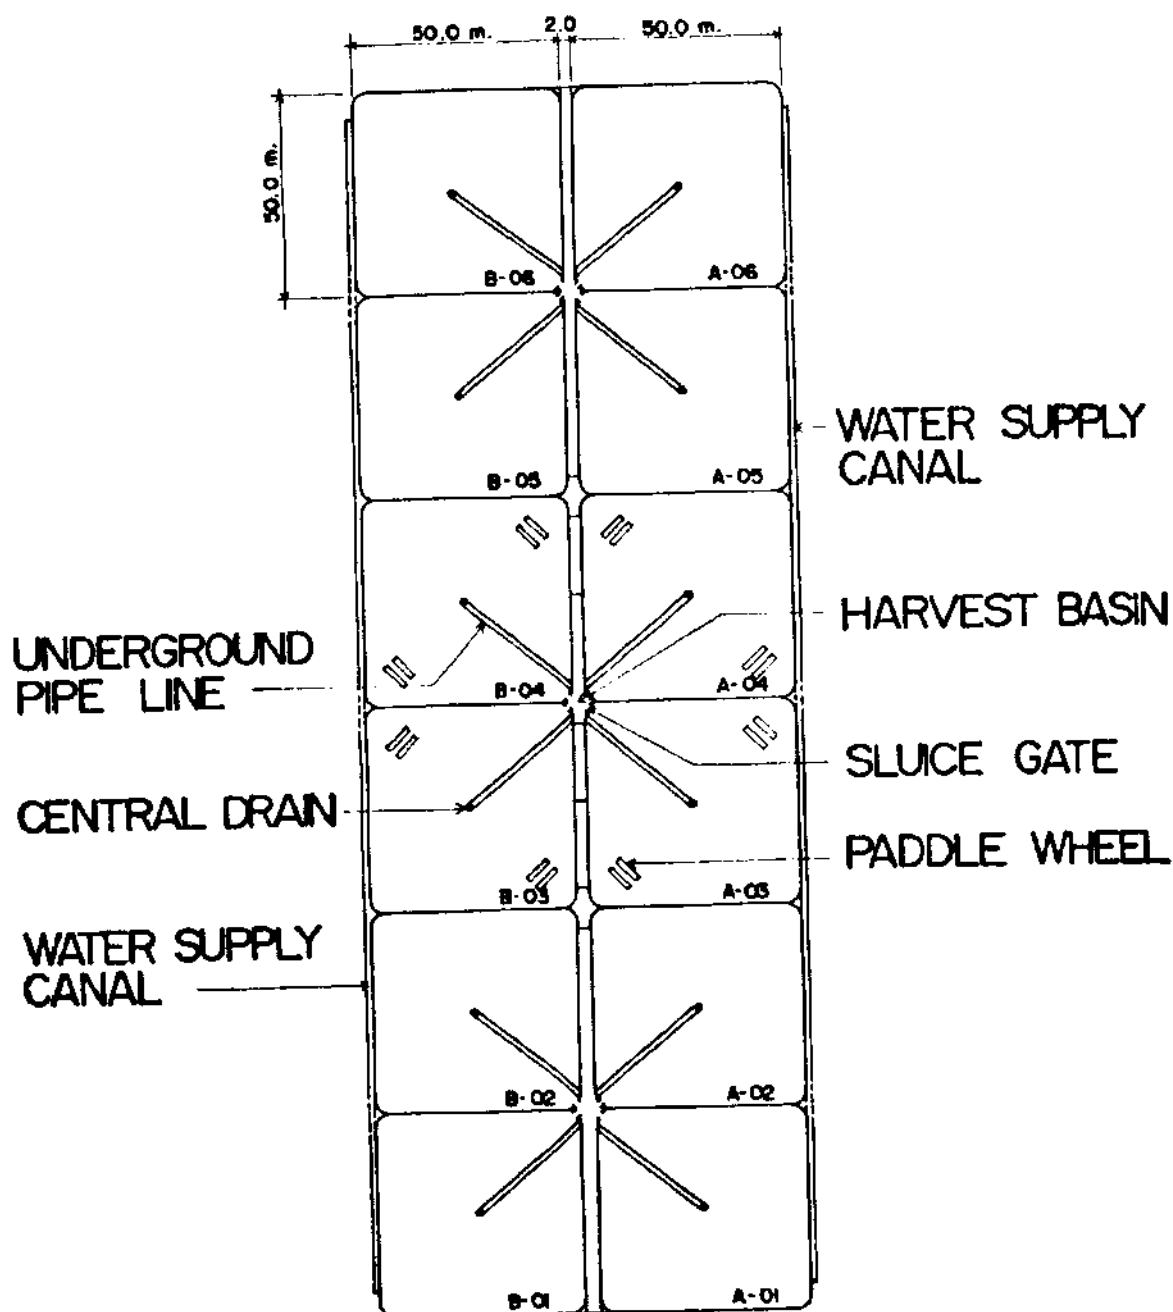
Concrete-walled pond design with center drains (Liu and Mancebo 1983).
